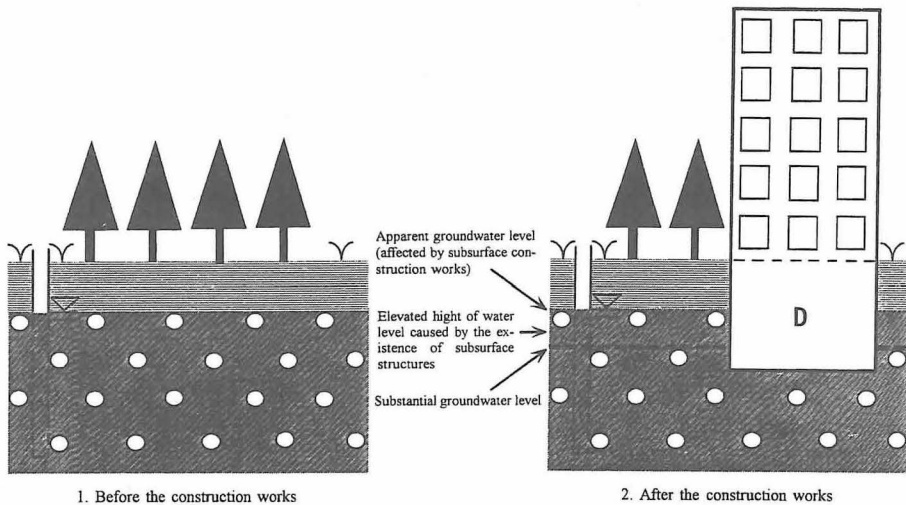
Elevation of groundwater level caused by subsurface construction works.
